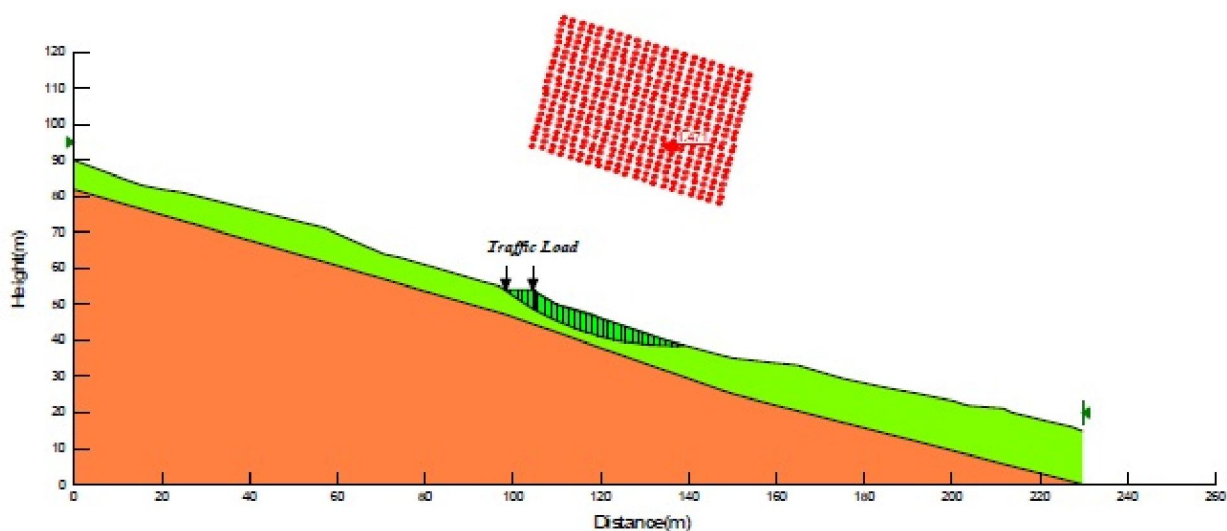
Slope stability in B-B section in effective soil stress conditions (static mode)
